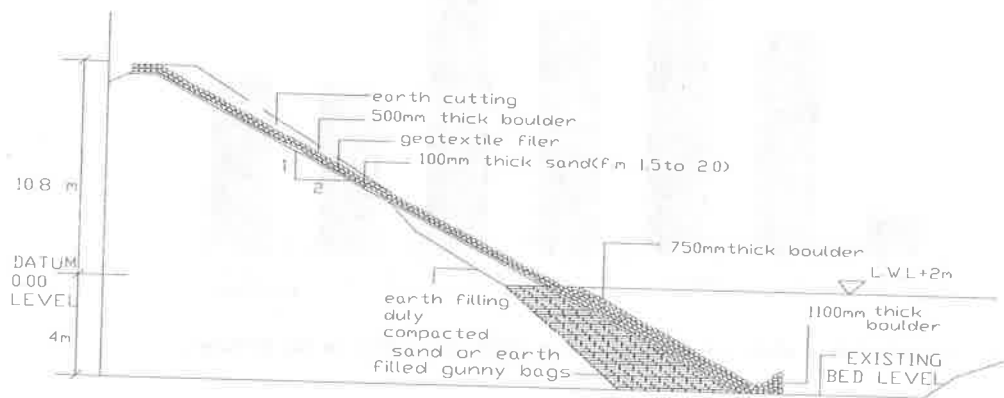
Implemented design plan for "Kanishail to Ghashitula"
